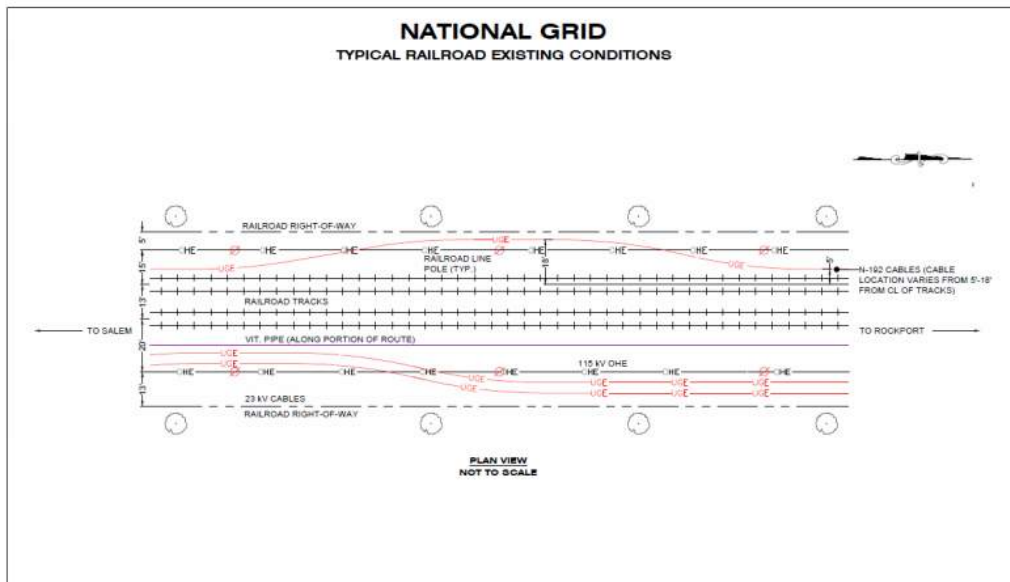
Plan View of Typical Railroad ROW with Existing Conditions
